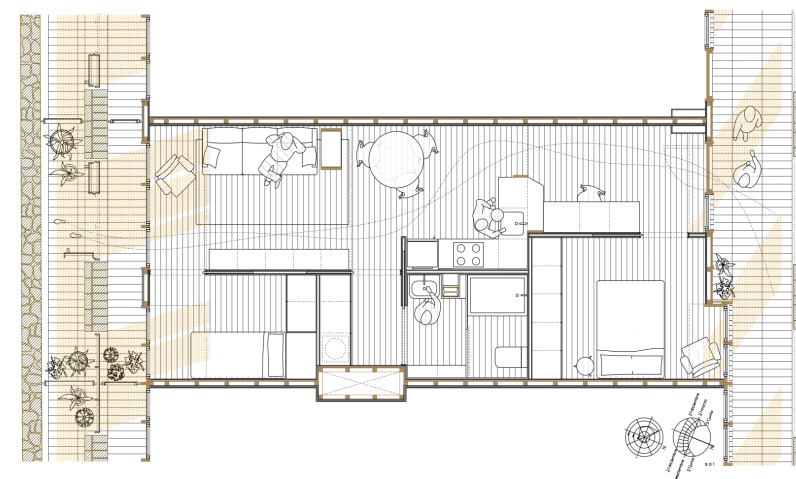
Floor plan. Source: Roldán Berengué architects / Jordi Surroca and Gael del Rio.
